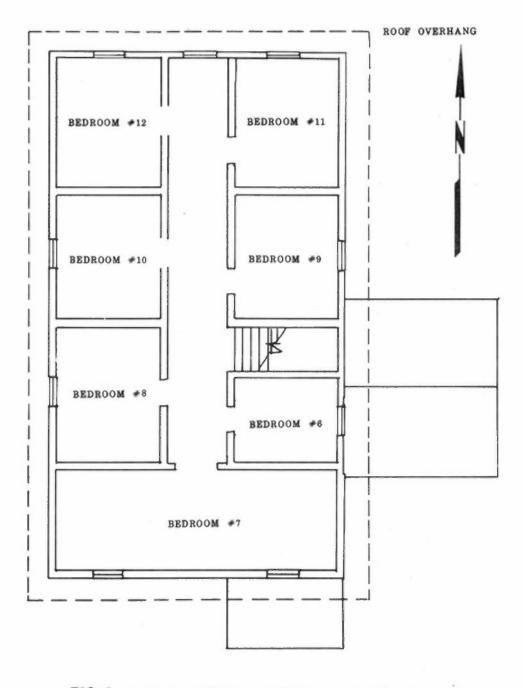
DENALI HOTEL - SECOND FLOOR PLAN
